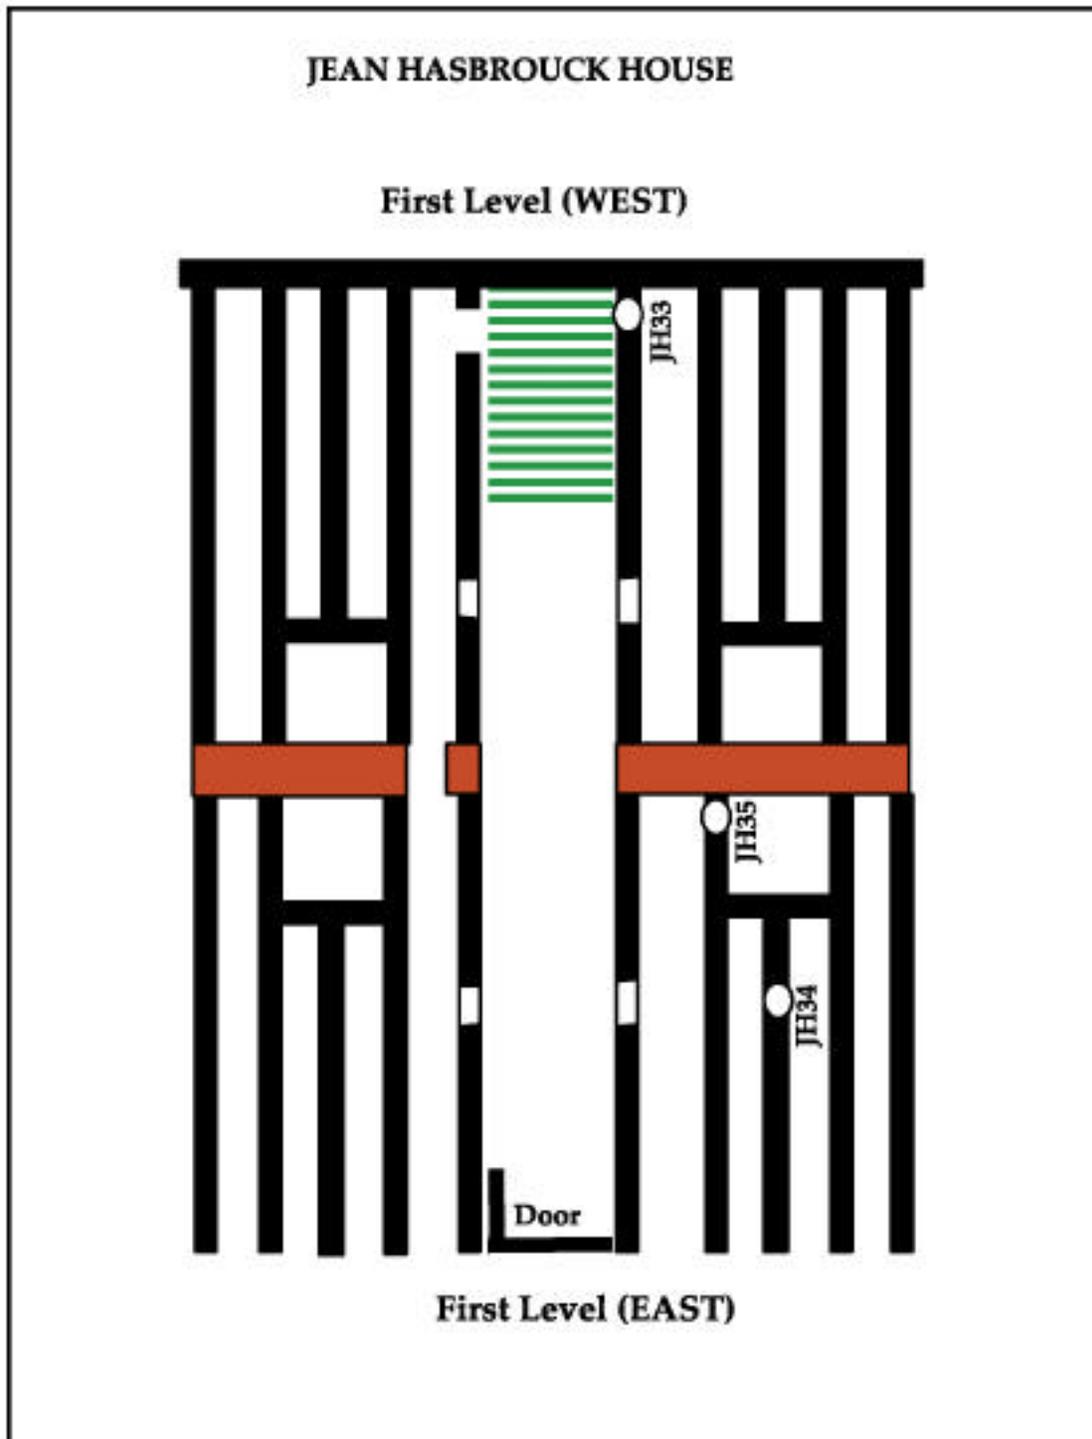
The sampling locations of the pine timbers on the ground floor (first level) of the Jean Hasbrouck house, New Paltz, New York.
